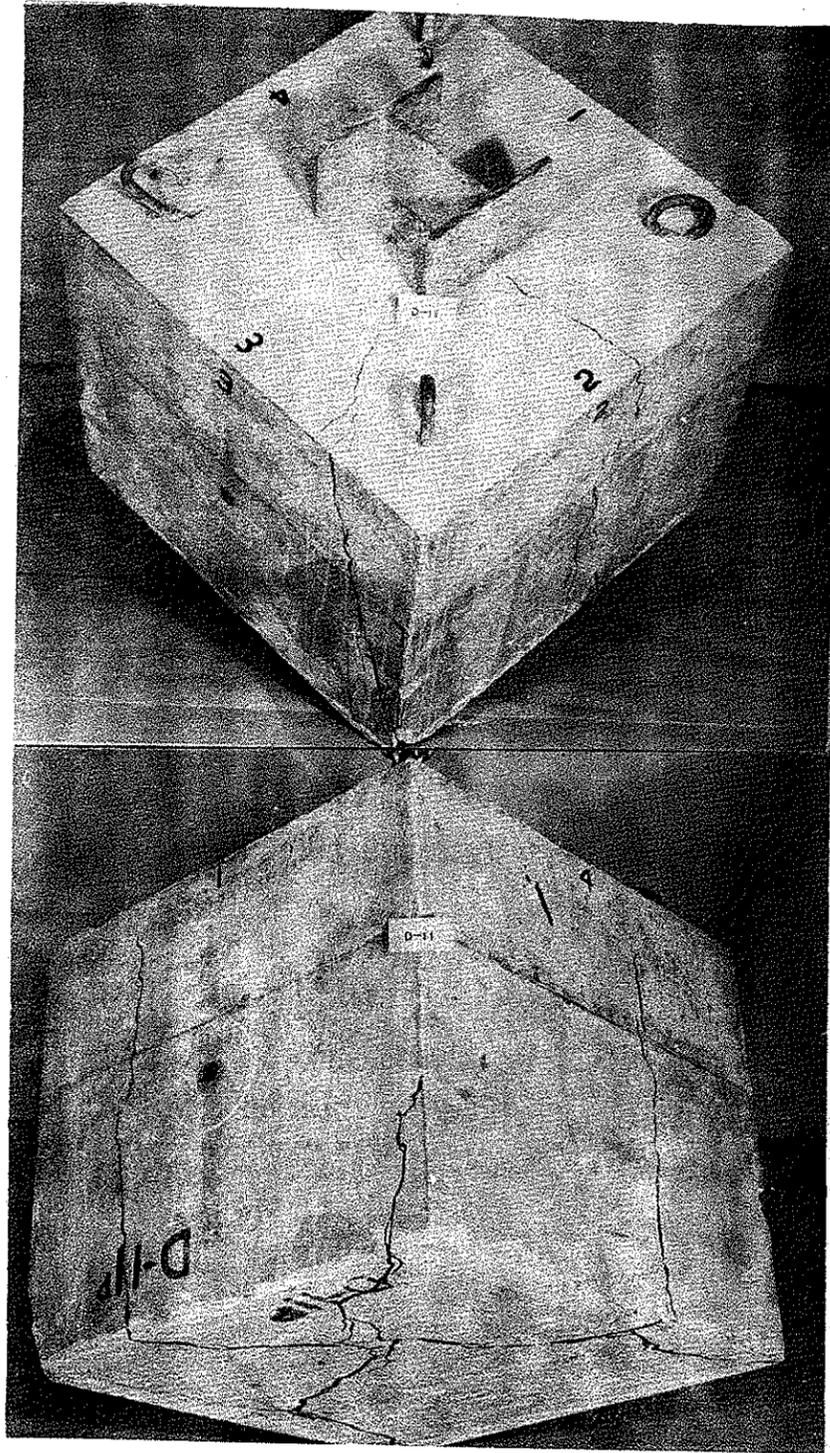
APPEARANCE OF SPECIMEN D-11 AFTER TESTING.
